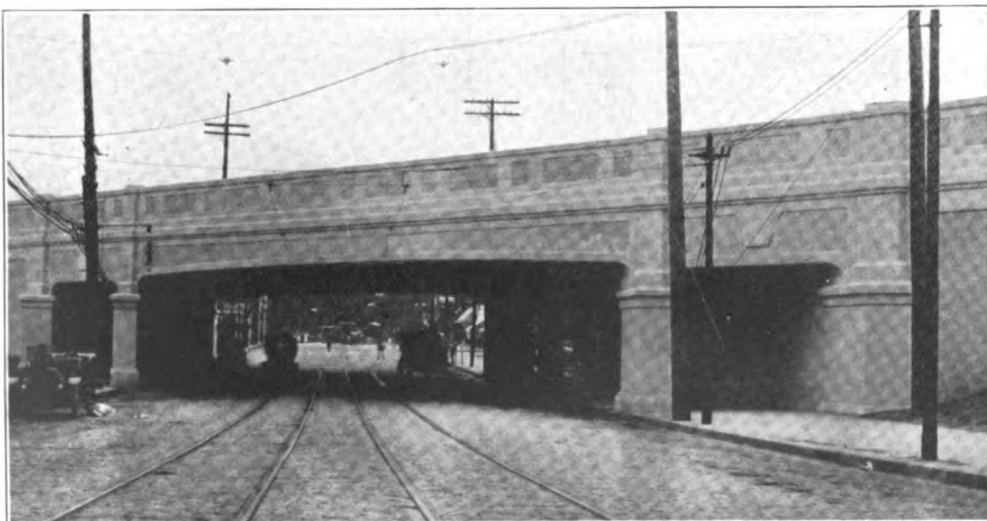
Euclid Ave. Bridge—Plate Girders with Concrete Fascias—Steel Columns Encased in Concrete.
